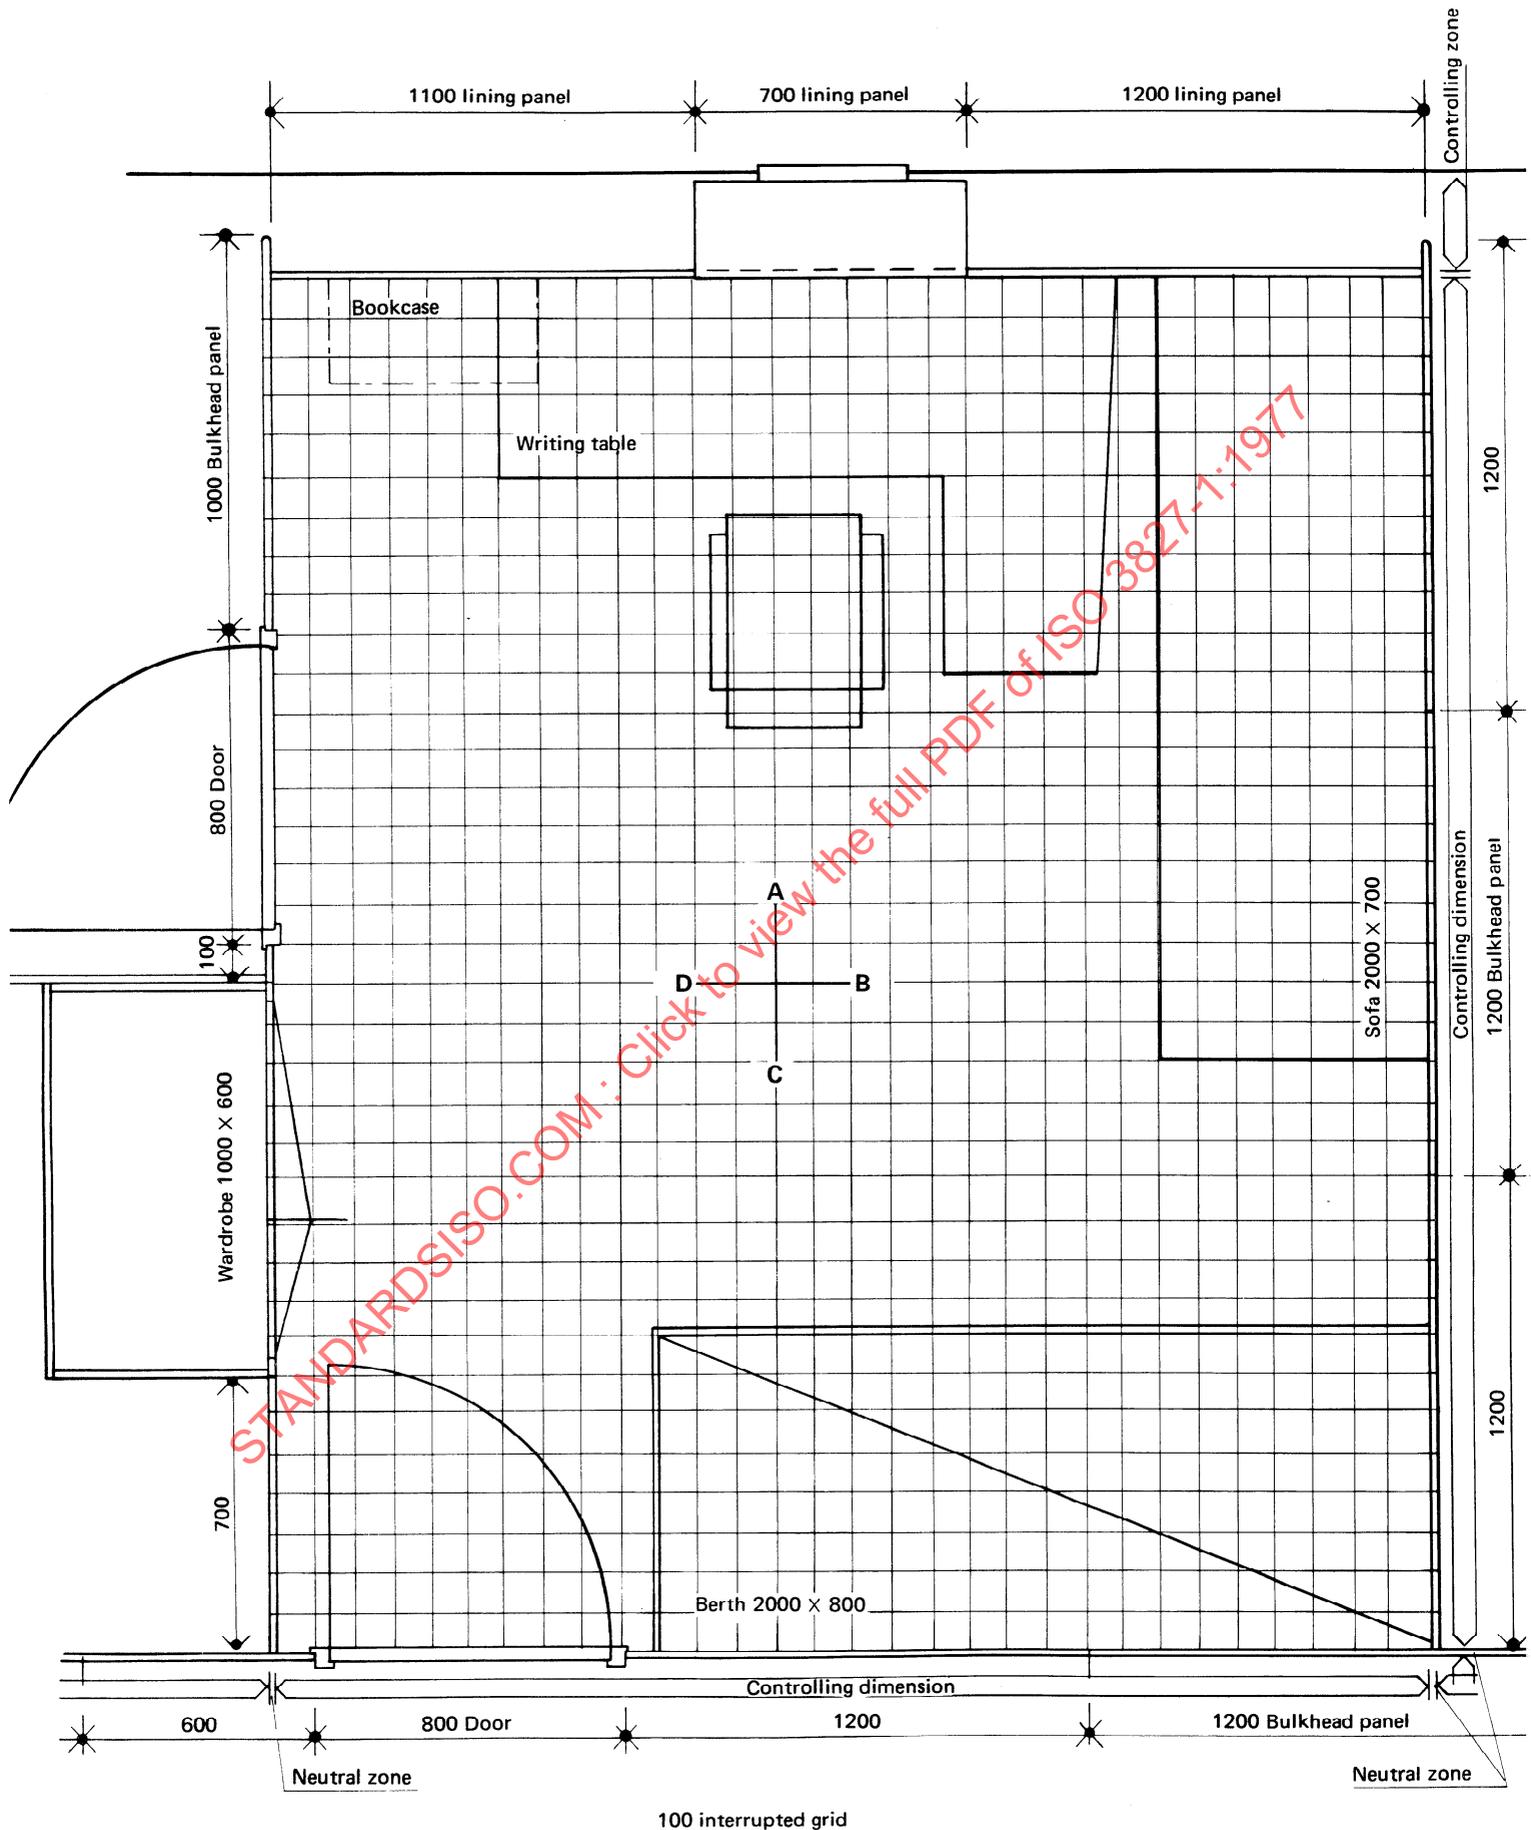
Typical officer's cabin : space plan, scale 1 : 20
